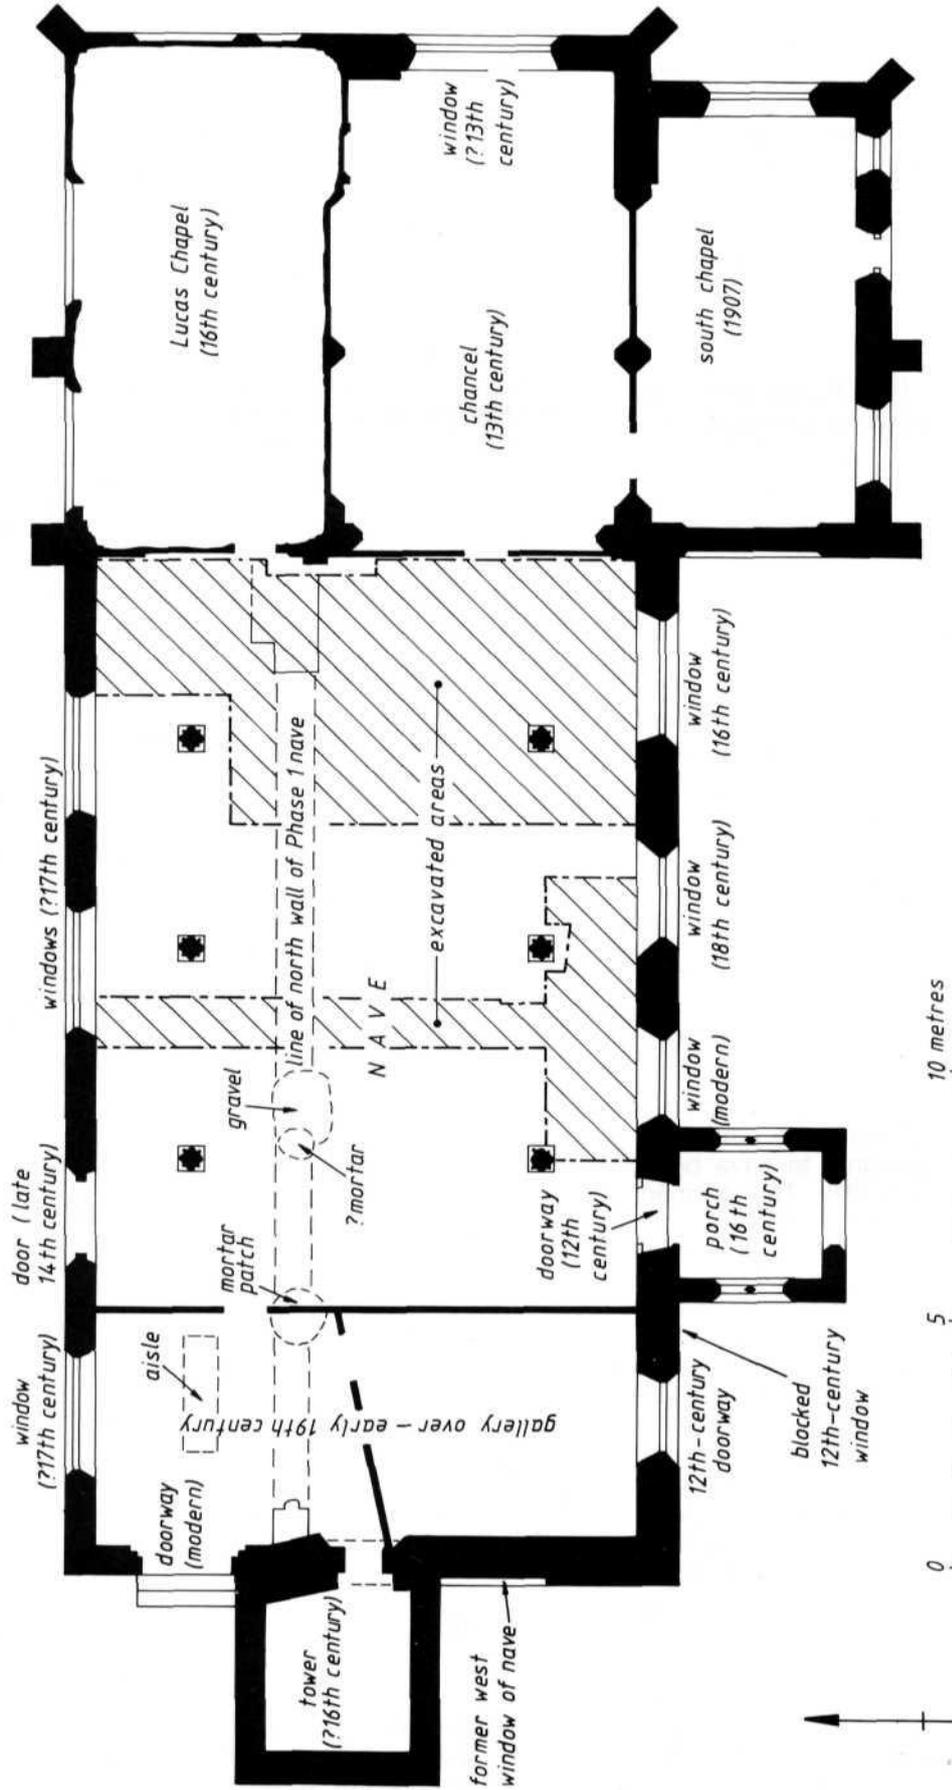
St Giles's Church 1975: the location of the trenches. 1:150. [Pages 221-30]
